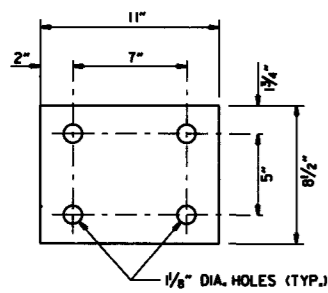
DETAILS OF WOOD LINE POST CONNECTIONS (W-BEAM)
